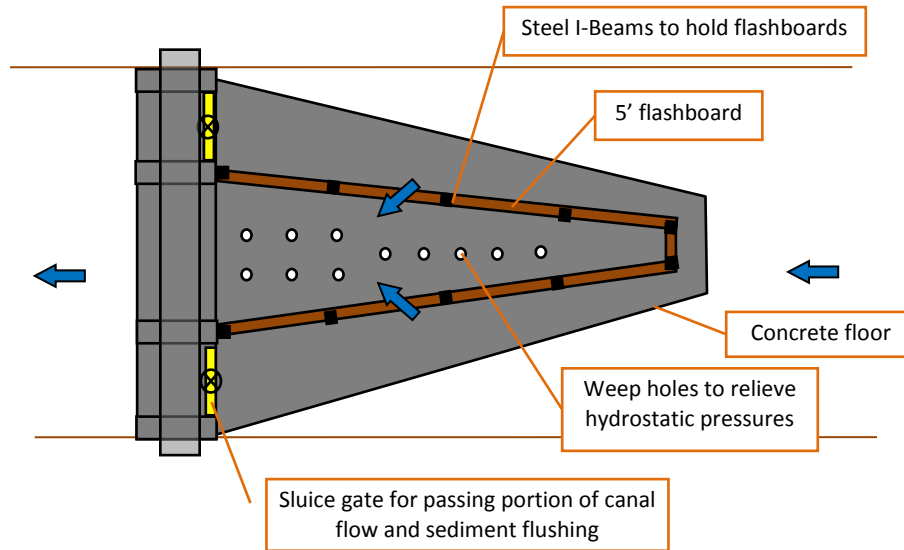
Example of a new LCW structure to be constructed along the MA Canal (not to scale)
